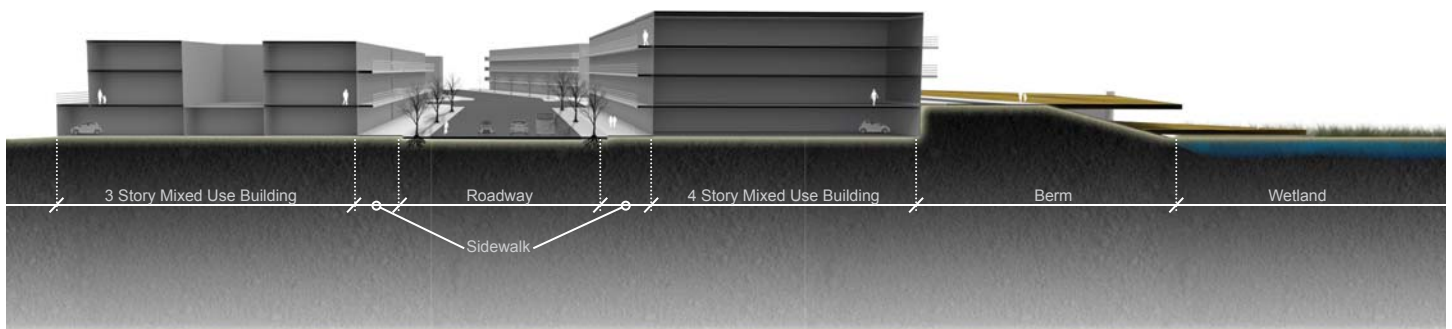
Section Cut Through Center of Plan, Original Scale 1/16"=1'
